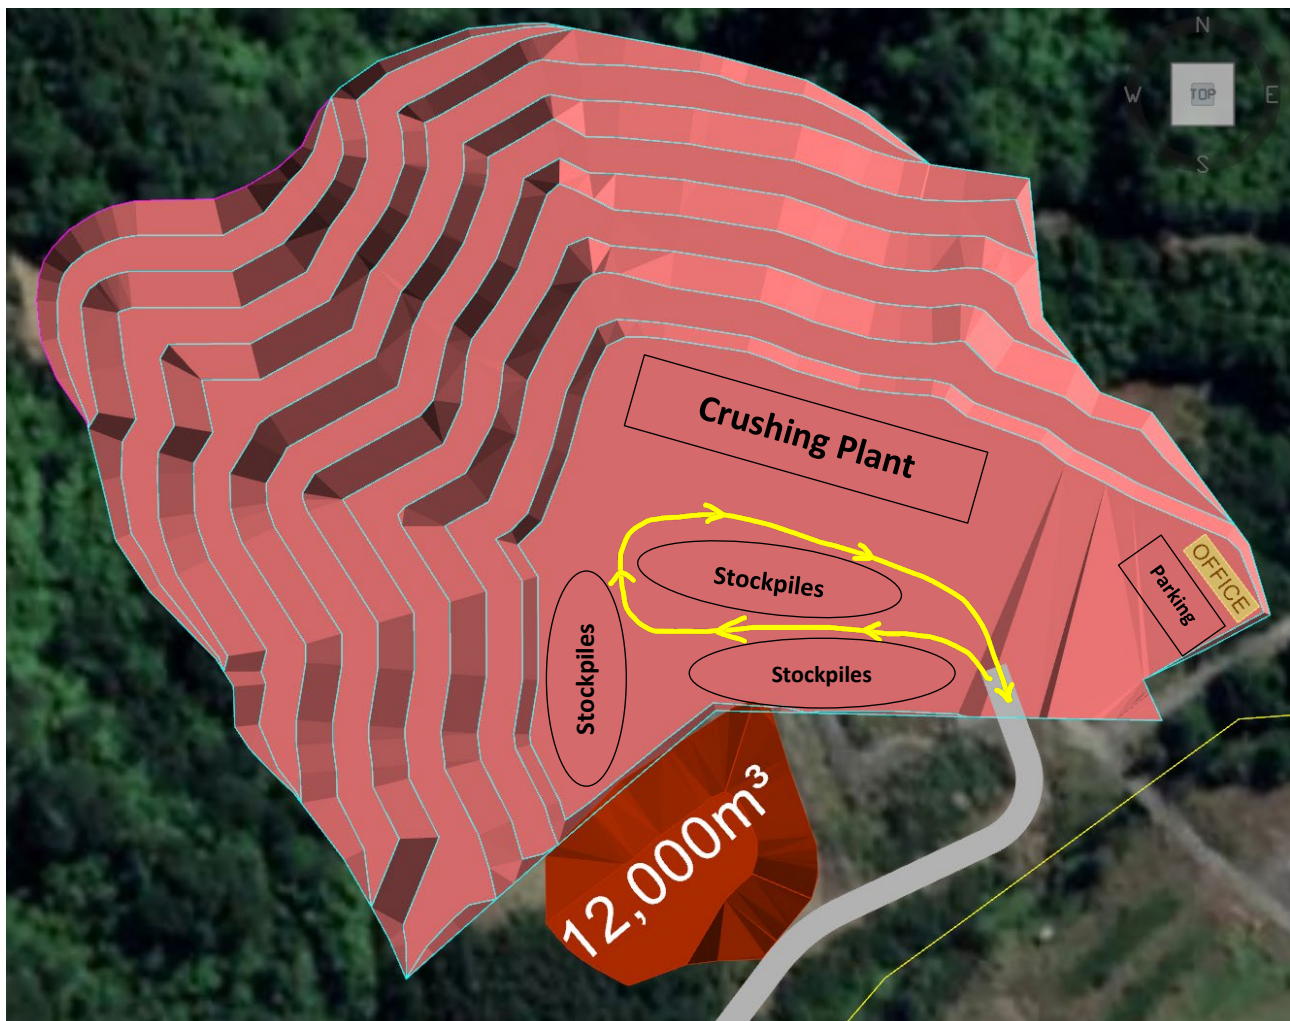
Access into the site from Pebble Brook Road (Commute, December 2023)
